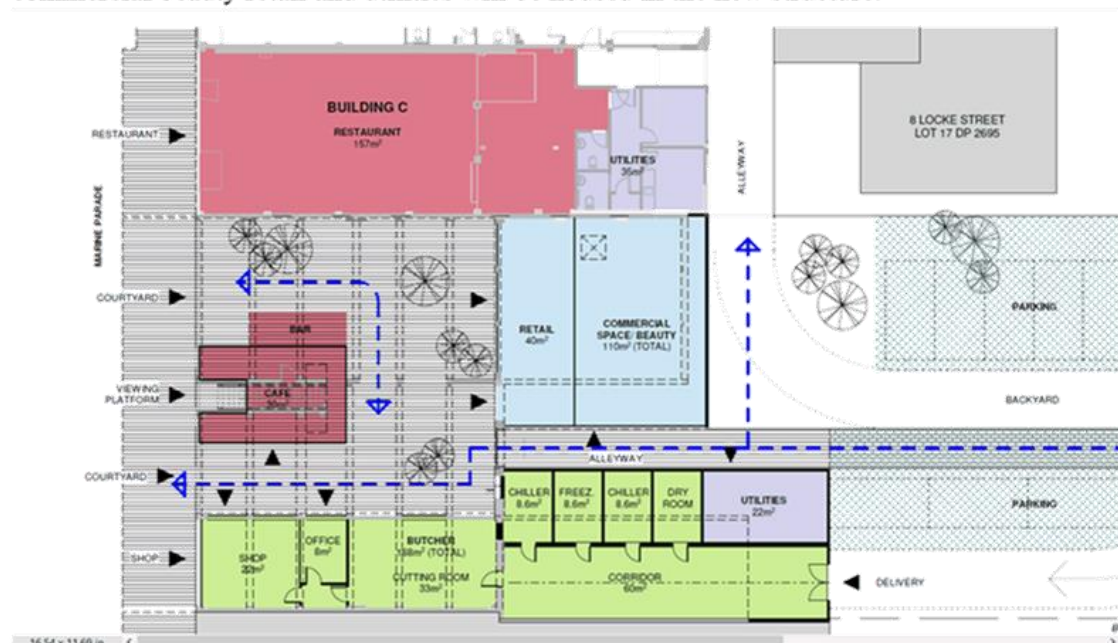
Concept plans of new uses of former Gemmell Building spaces. Source: Vision projects
